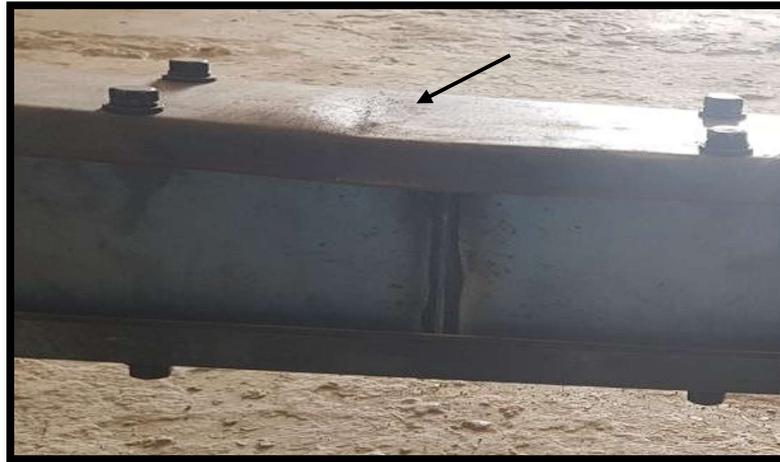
Shows the failure that occurs at Specimen CF66L.
